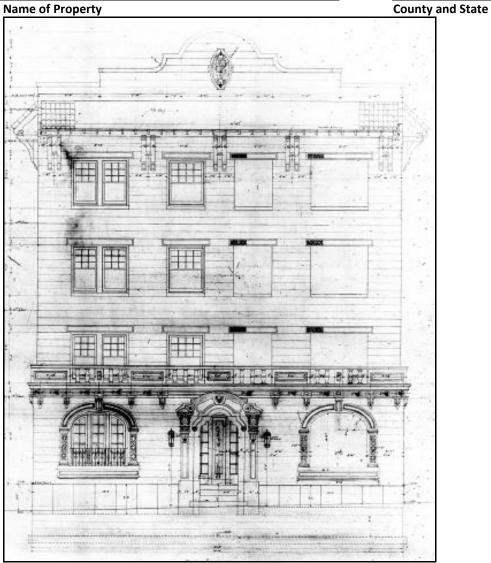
Architectural rendering of the front (west) facade of the west wing, showing the entrance in the center, fenestration, details of window hoods, and arched parapet wall. Note that the cornice above the ground floor appears to have been simplified instead of "built as designed."
